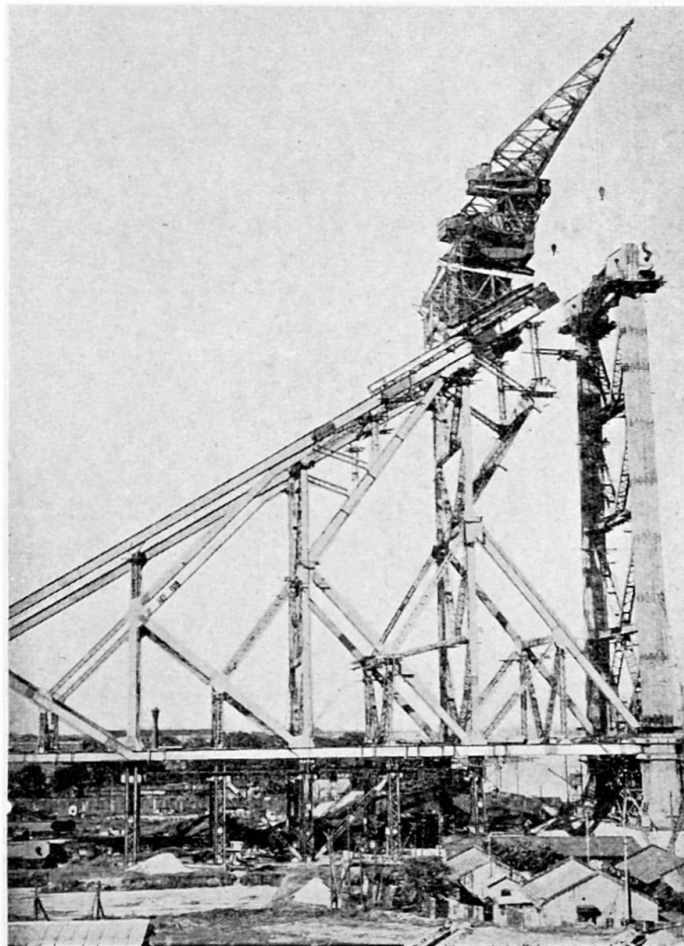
New Howrah Bridge, Calcutta. Erection of anchor arm on falsework. Note fleeting tracks for creeper crane and temporary members supporting top chord
